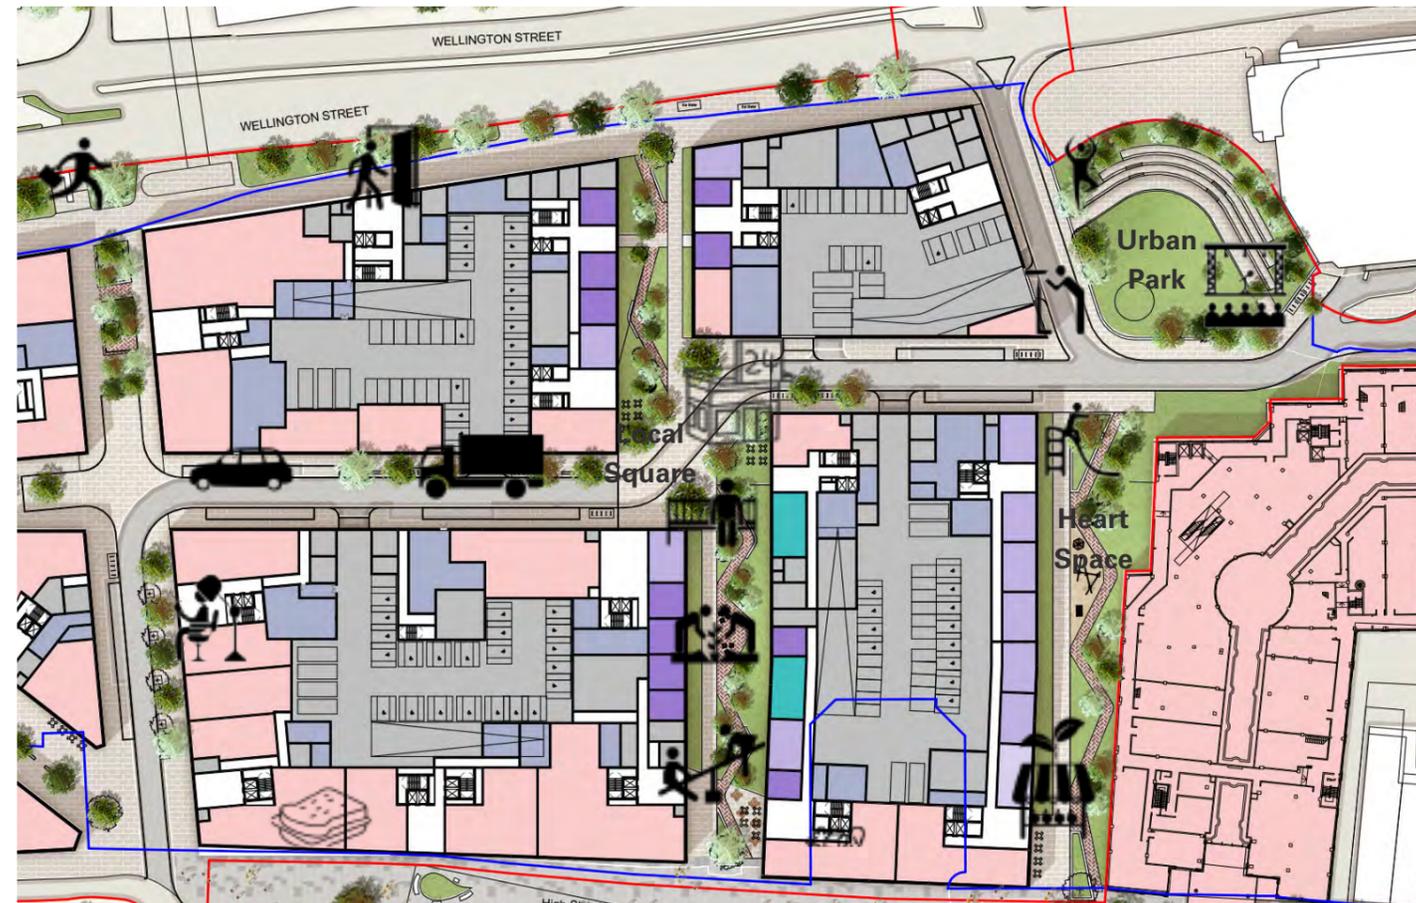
Ground floor level plan highlighting Residential Neighbourhood Character Area and accompanying examples of Town Centre uses and activities
